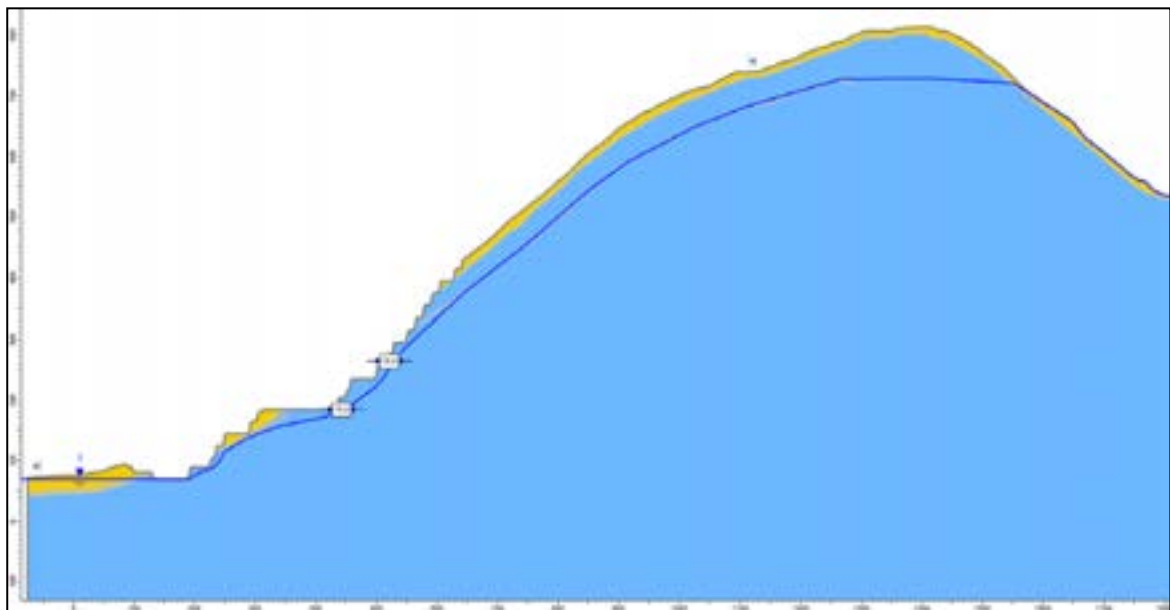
Example section looking north showing groundwater surface adjusted to the quarry profile
